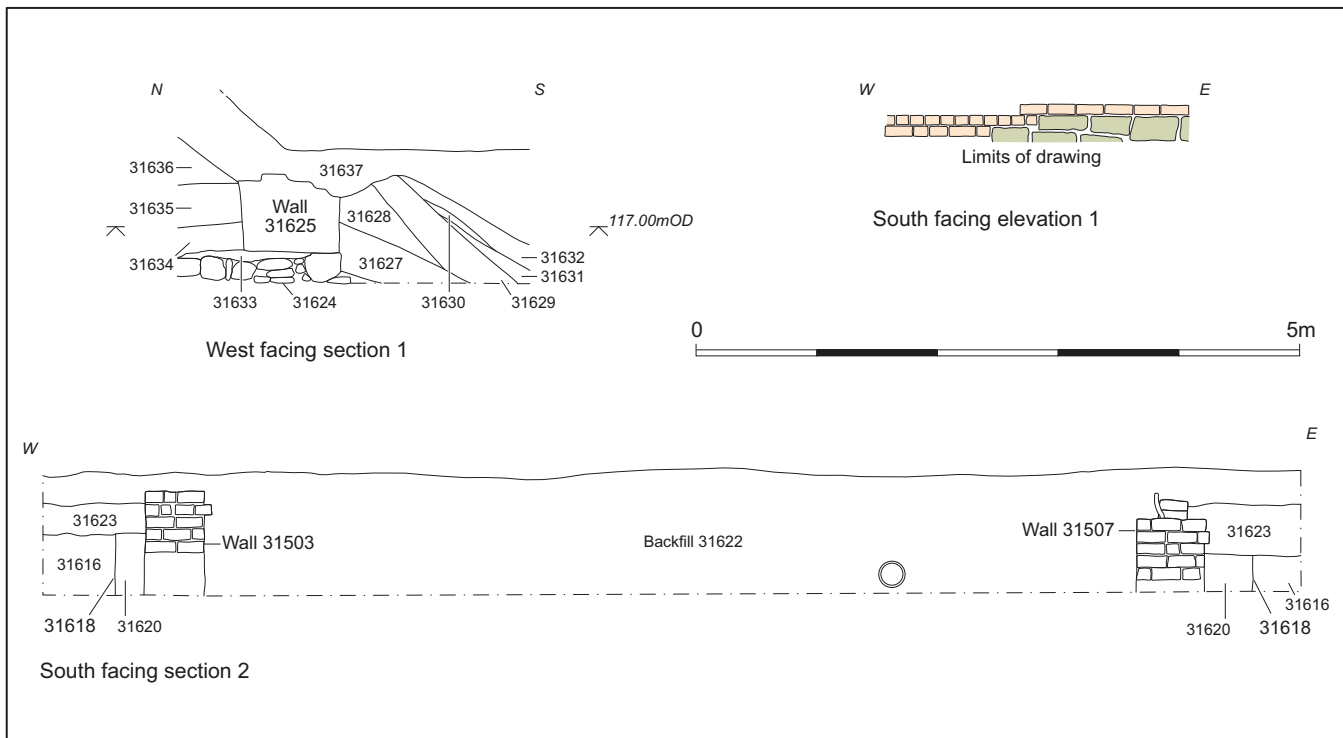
West-facing section through the northern wall of the canal; elevation of the rear face of the inner canal wall, showing the change from stone to brick construction; south-facing section across the infilled basin
